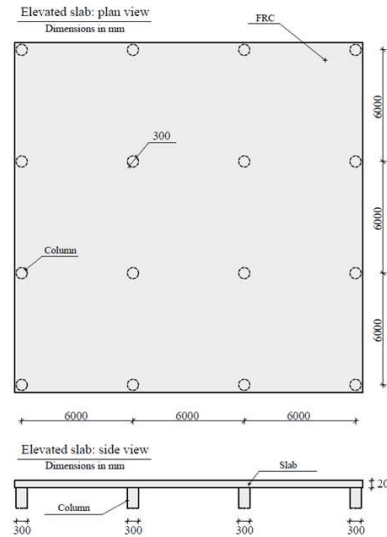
Geometry of the elevated slab considered in this work. / Geometria della piastra considerata.
